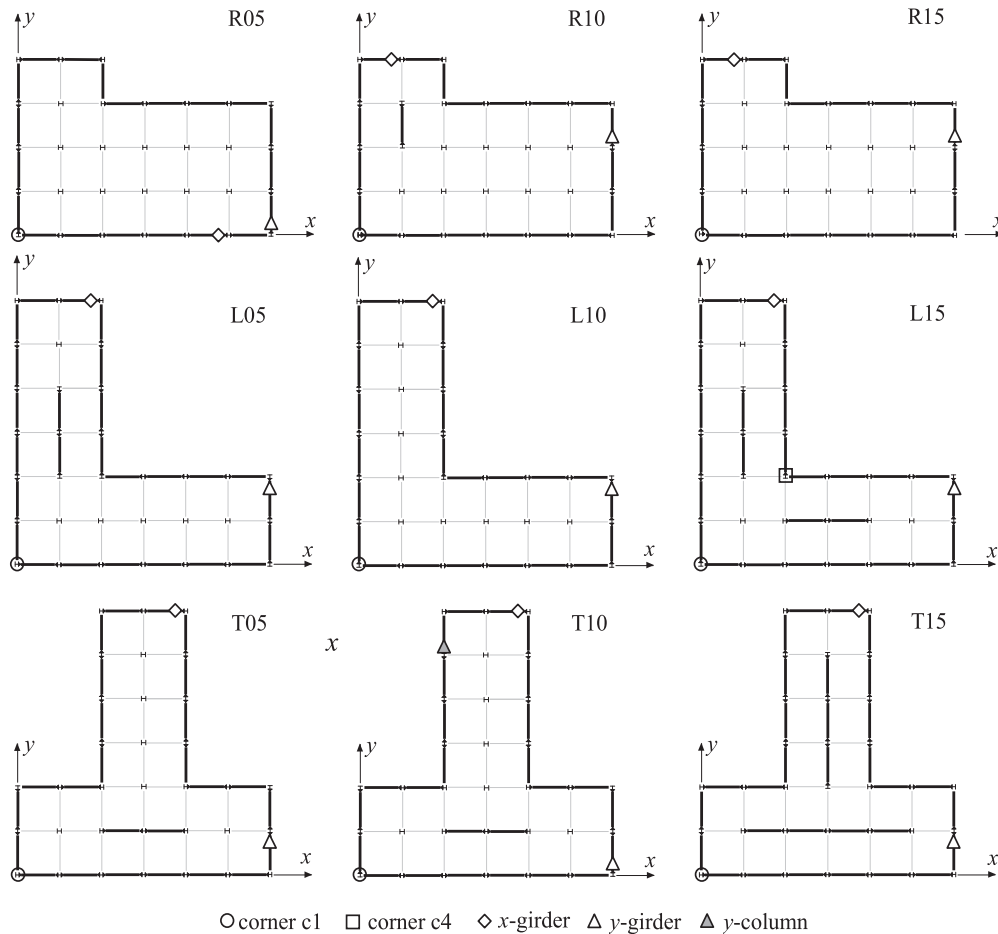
Plan views of nine unsymmetric-plan buildings.
